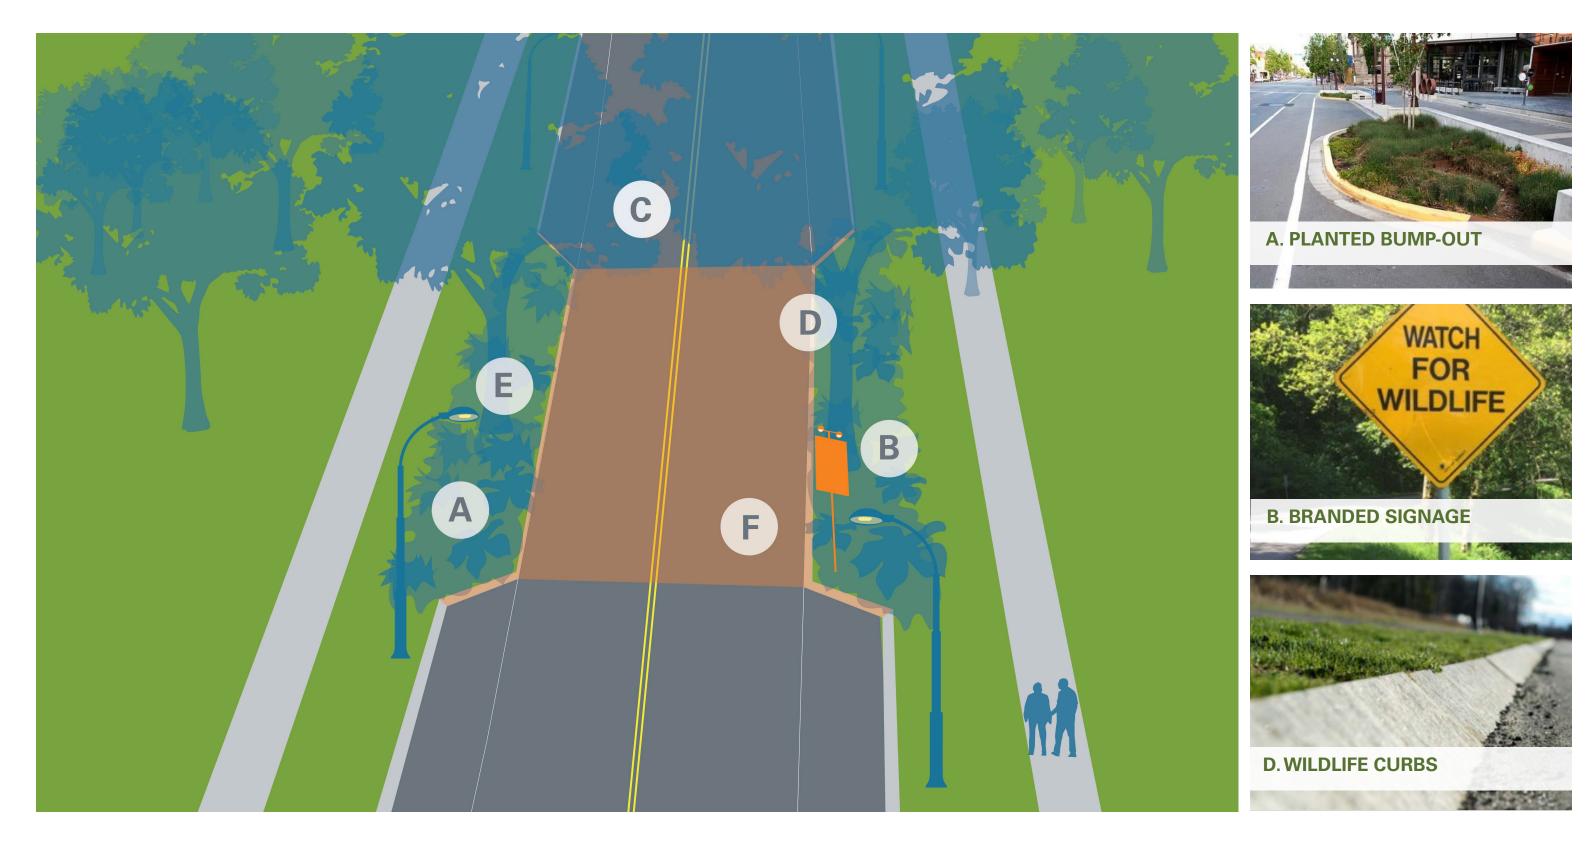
COLLECTOR ROAD - TERRESTRIAL CROSSING
